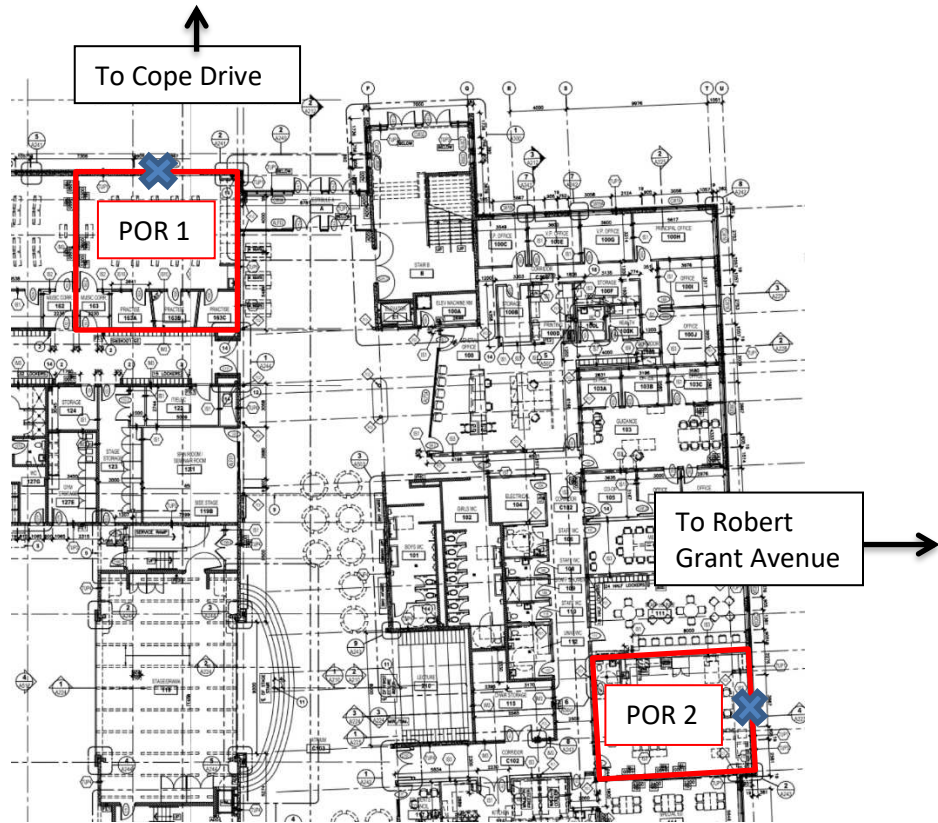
Floor plan section of ground floor (northeast corner) showing the plane of window (POW) points of reception, POR 1 and POR 2
